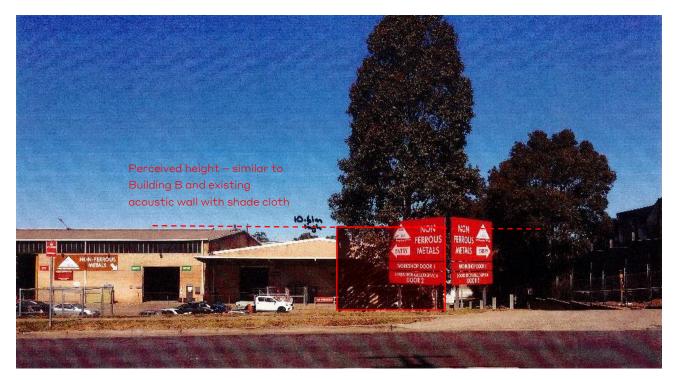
Tattersall Road frontage: photo with the proposed fire tank envelope
